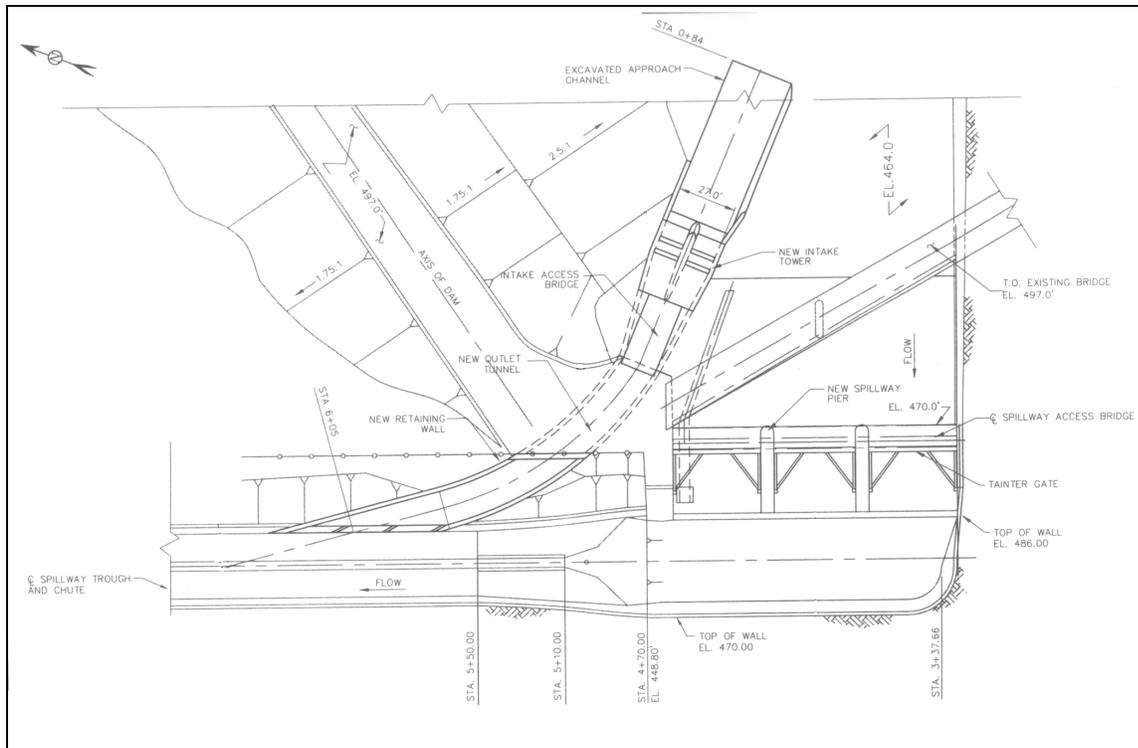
Proposed Skookumchuck Dam Outlet Structure and Spillway Modifications
